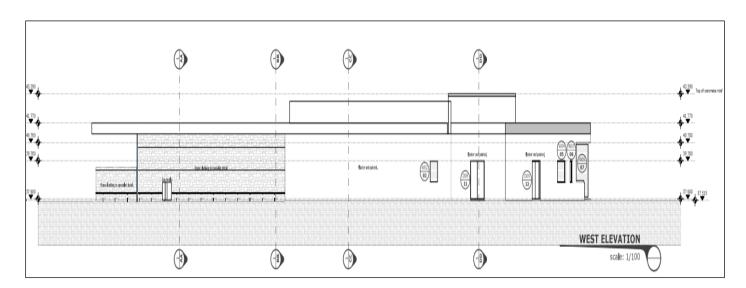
West elevation of the proposed entertainment facility (TMBA, 2018)
